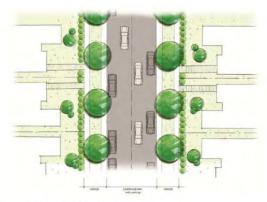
Indicative Layout of a Two Lane Sub-Arterial Road
